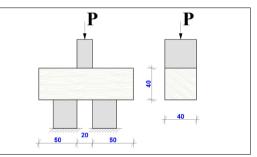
Outline of the full cross-section sheared wood test specimen experiment.
